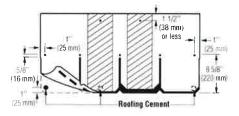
When installing Grand Manor Shangles on steep slopes, use seven nails and three spots of asphalt roofing cement.
